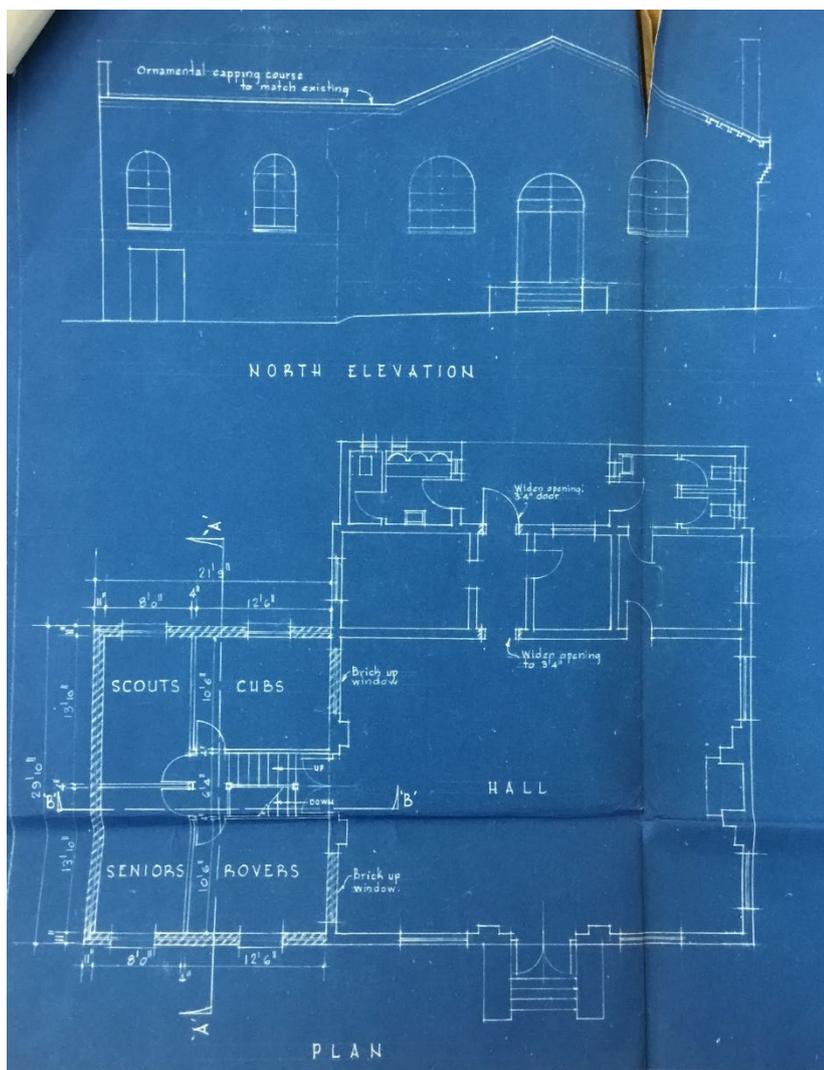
Best Overend Architect, Plan of Deepdene Scout Hall, c.1952, showing proposed alterations to the building. (Source: Public Building file, PROV)
